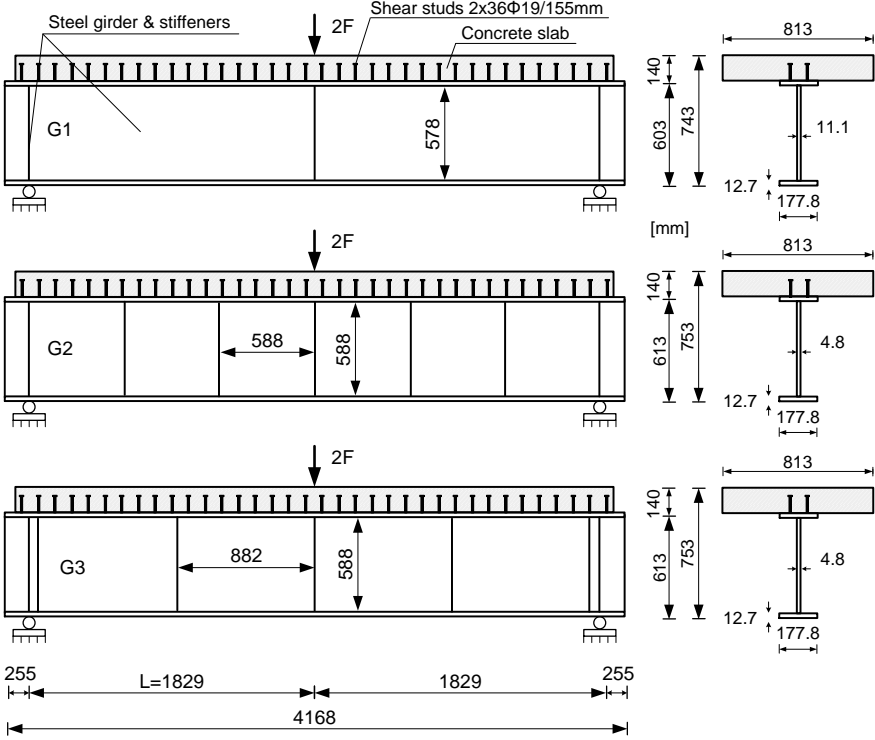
Dimensions and static system of the Aziz' girders in [13]
